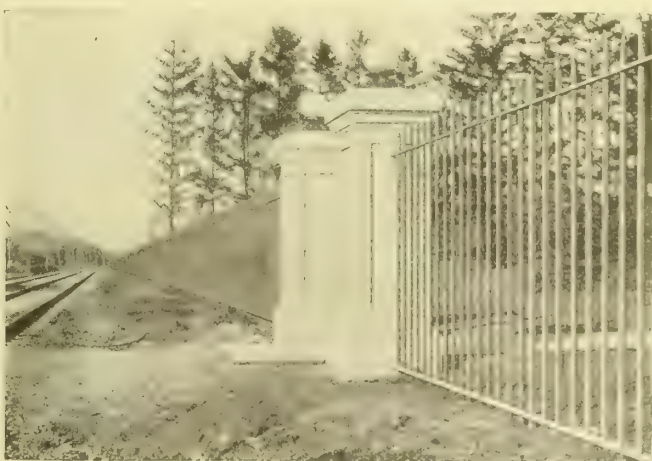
FS. COMPLETE INSTALLATION OF WROUGHT IRON FENCING, INCLUDING CONCRETE PIERS AND LAMPS, ST. ELIZABETH CONVENT, CONVENT, N. J.
